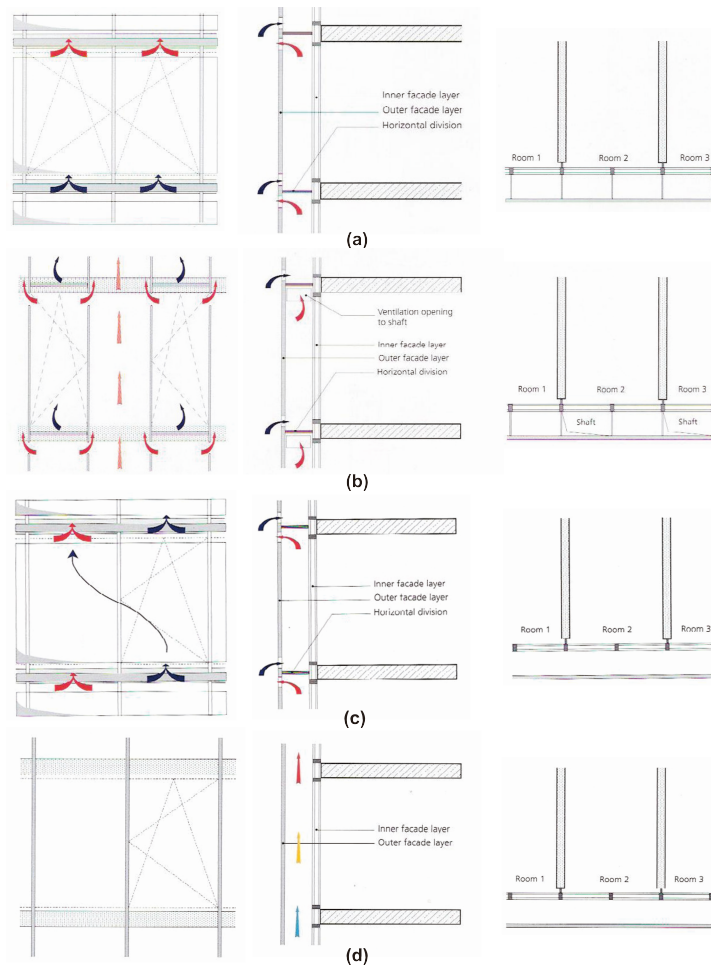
Types of Double-skin façade according to the intermediate space form: Elevation (left), section (middle) and plan (right) of (a) Box-type window; (b) Shaft-box façade; (c) Corridor façade and (d) Multi-storey façade (Oesterle et al., 2001).
